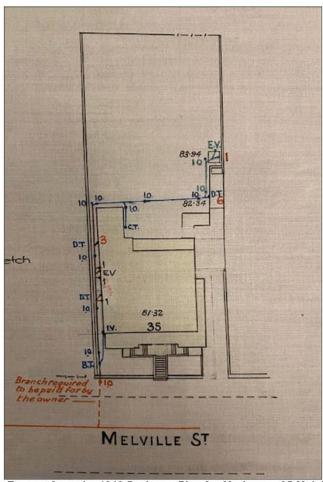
Excerpt from the 1919 Drainage Plan for Mr James, 35 Melville Street (Hobart City Council)
